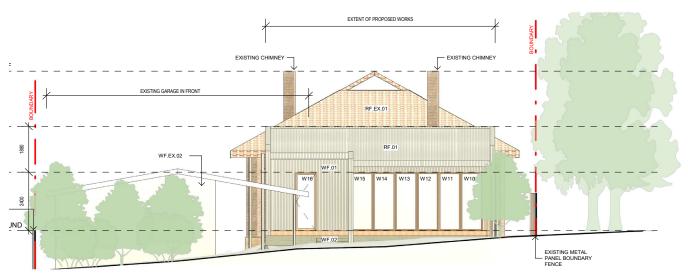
DA_301 South (Rear) Elevation - Proposed (LVA, 2025)
